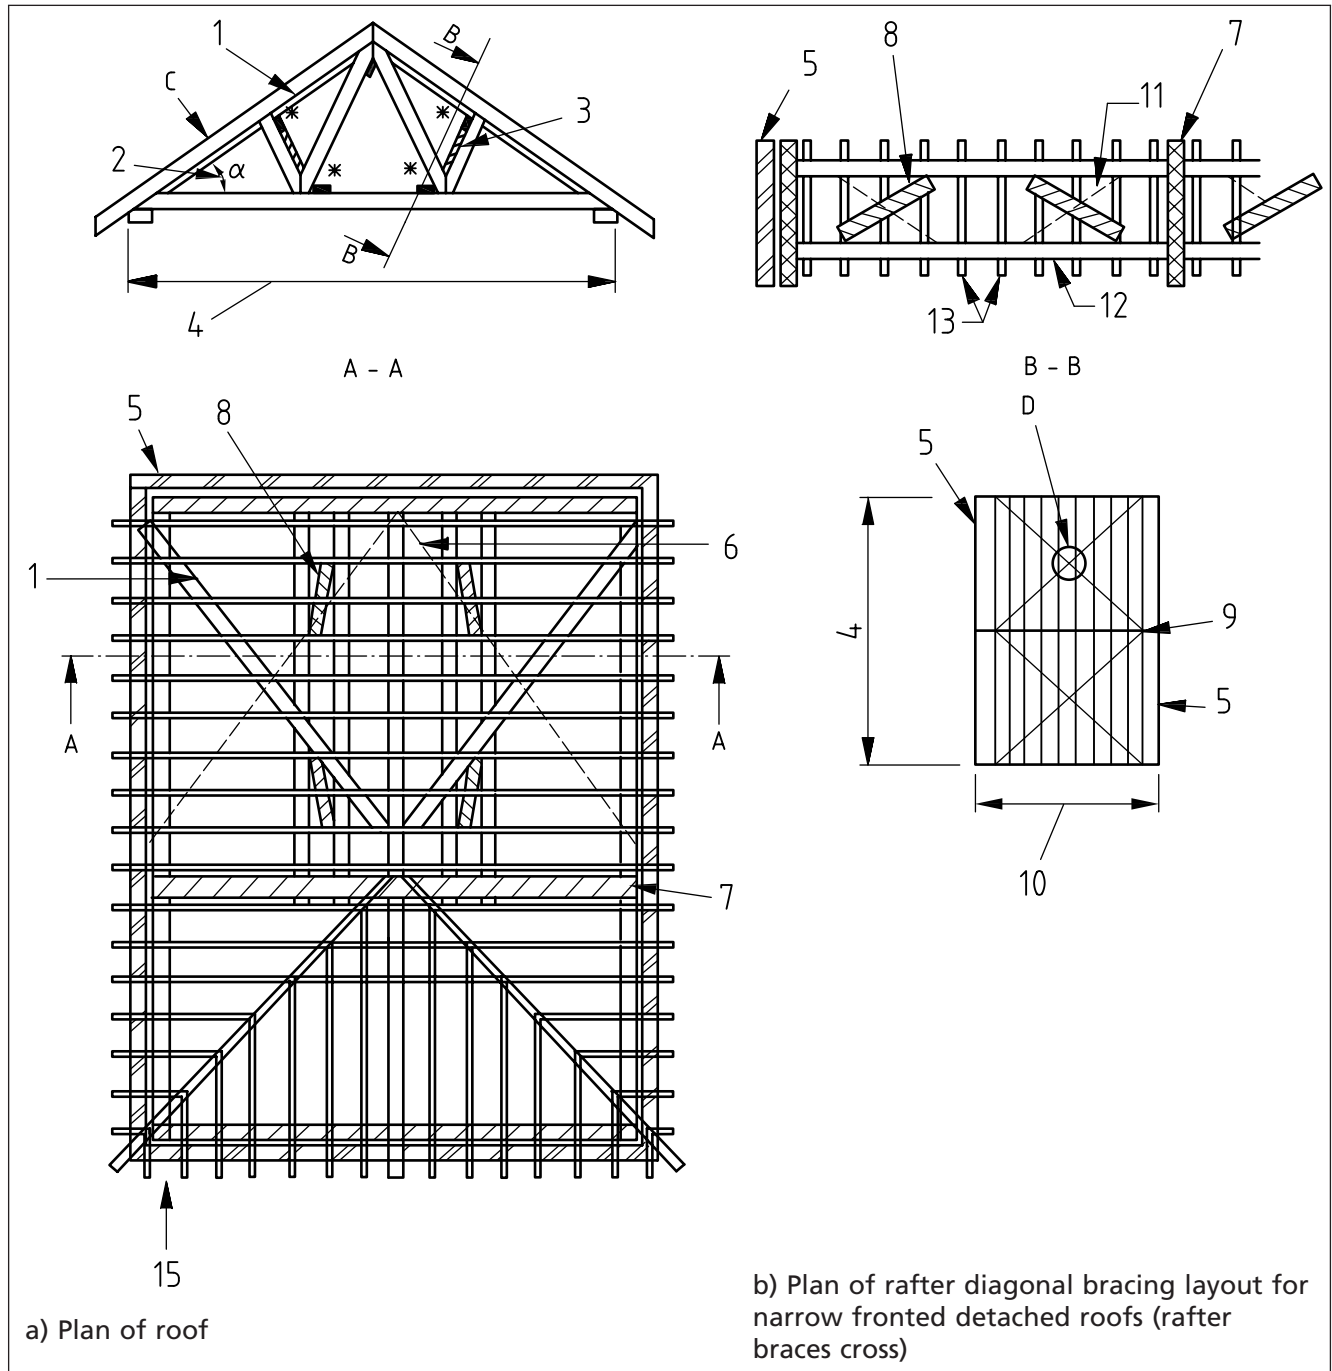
Standard bracing for rafter and web members of duopitch trussed rafters
